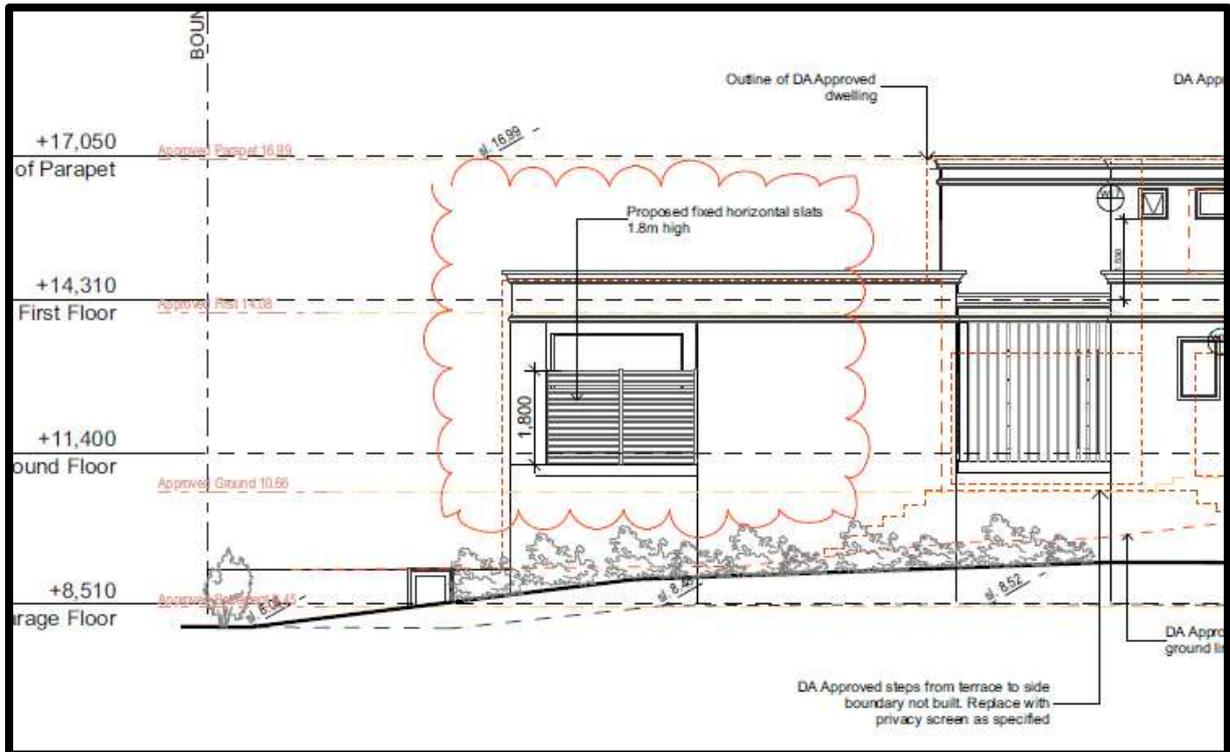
Extract of amended north side elevation (Source: Gelder Architects, August 19).
